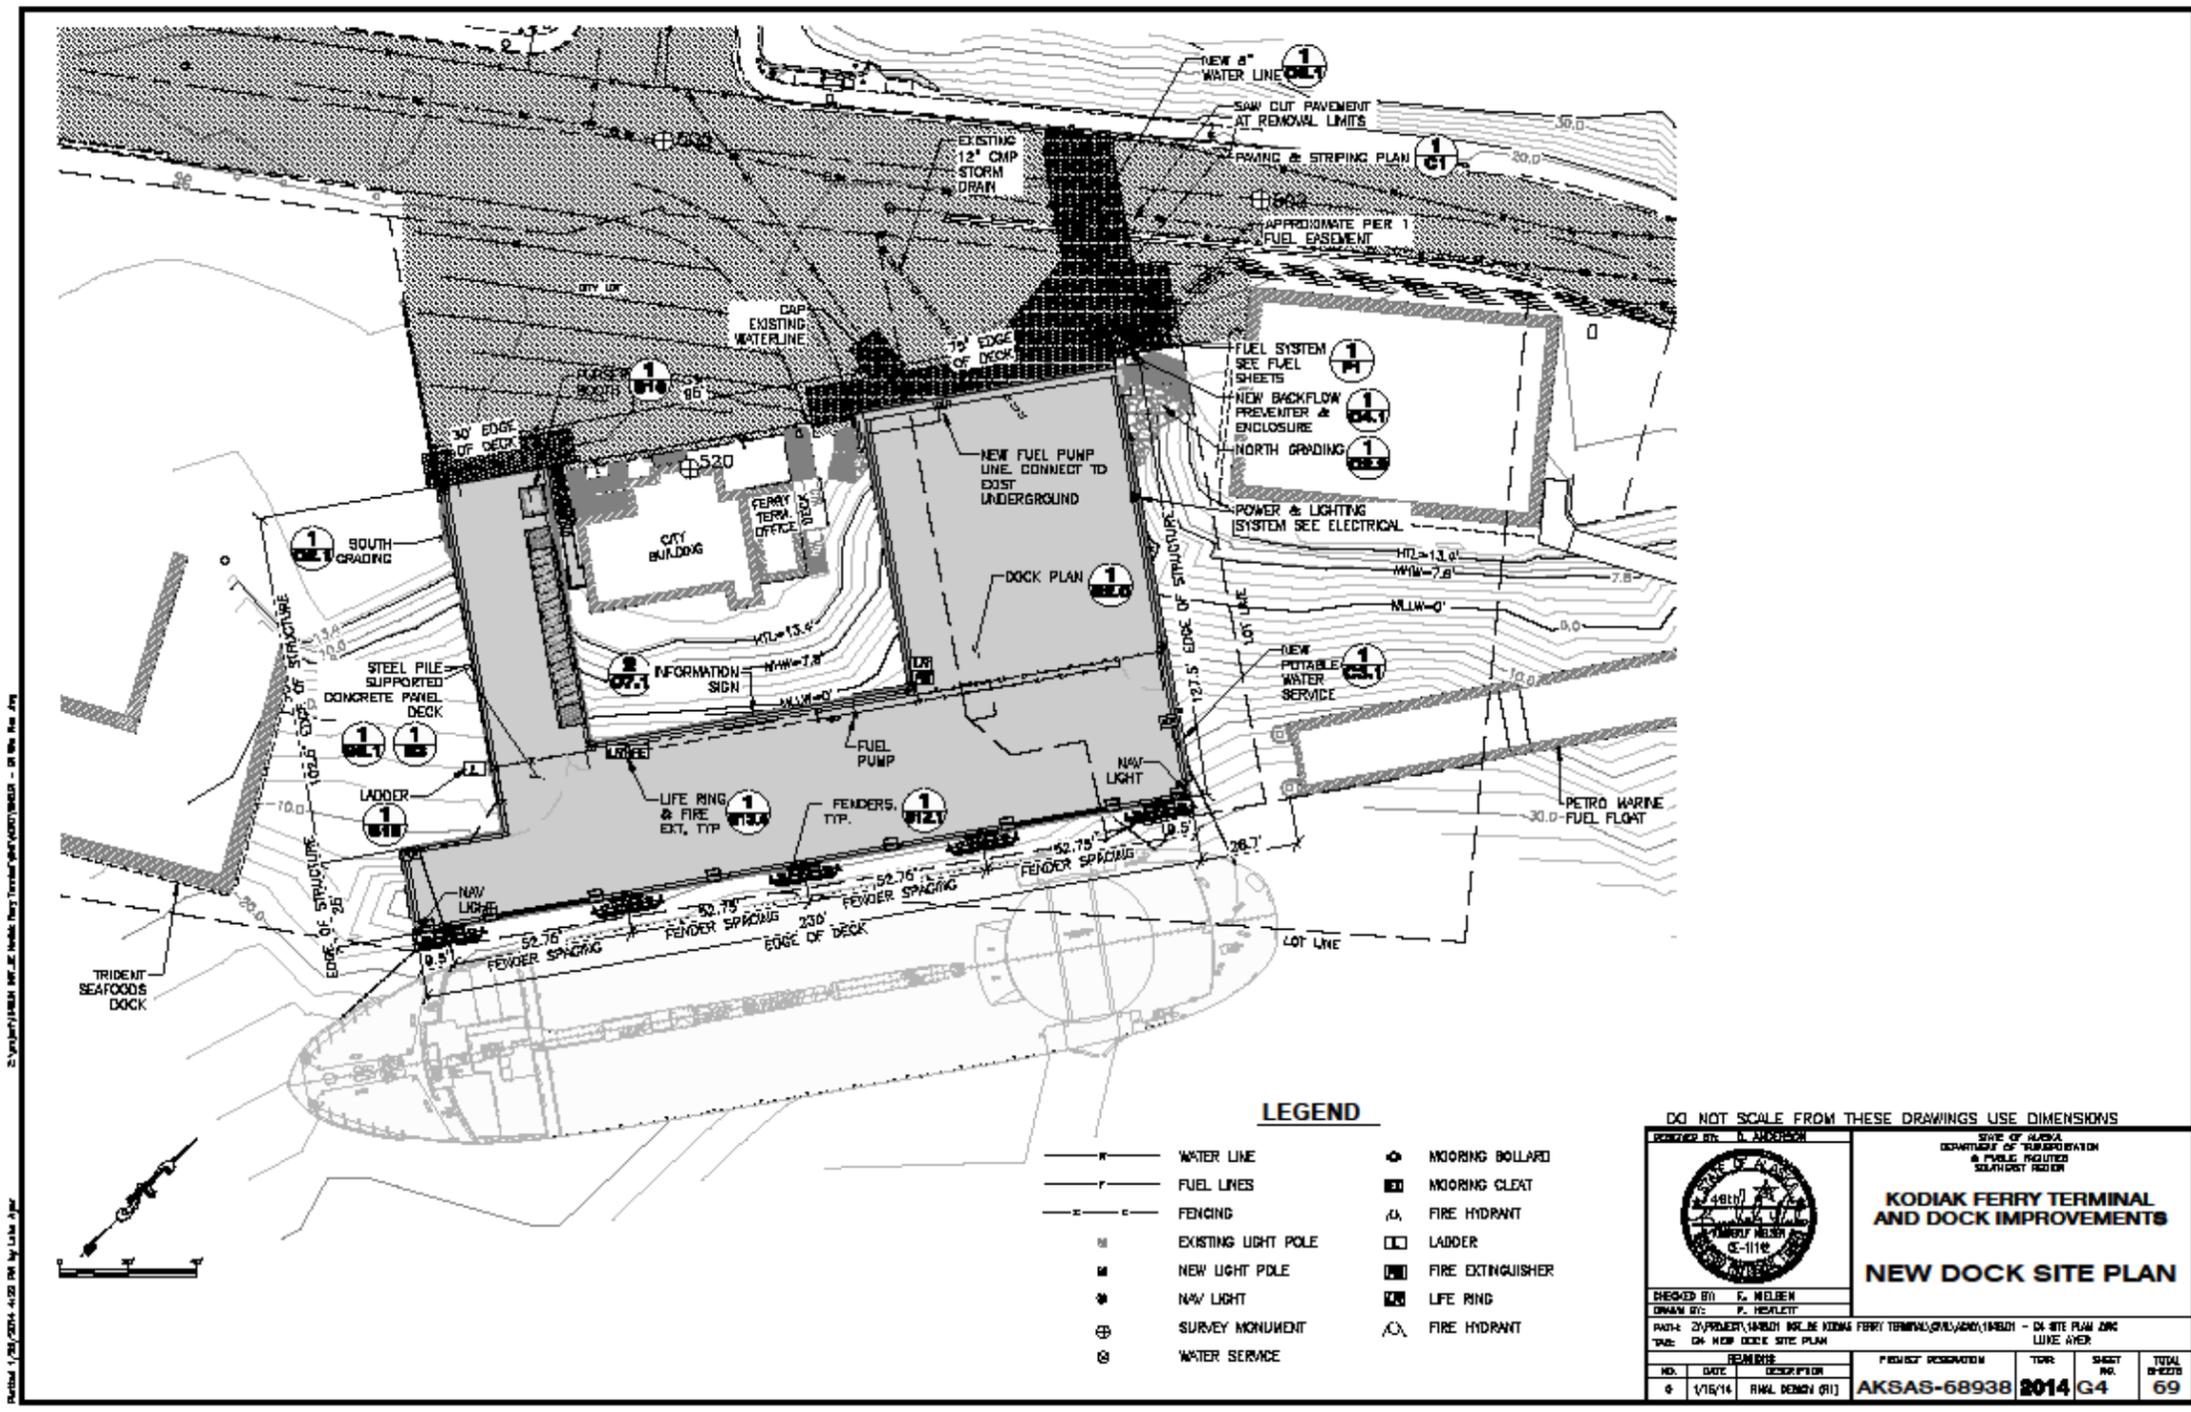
Plan view of the proposed new Pier 1 ferry terminal
